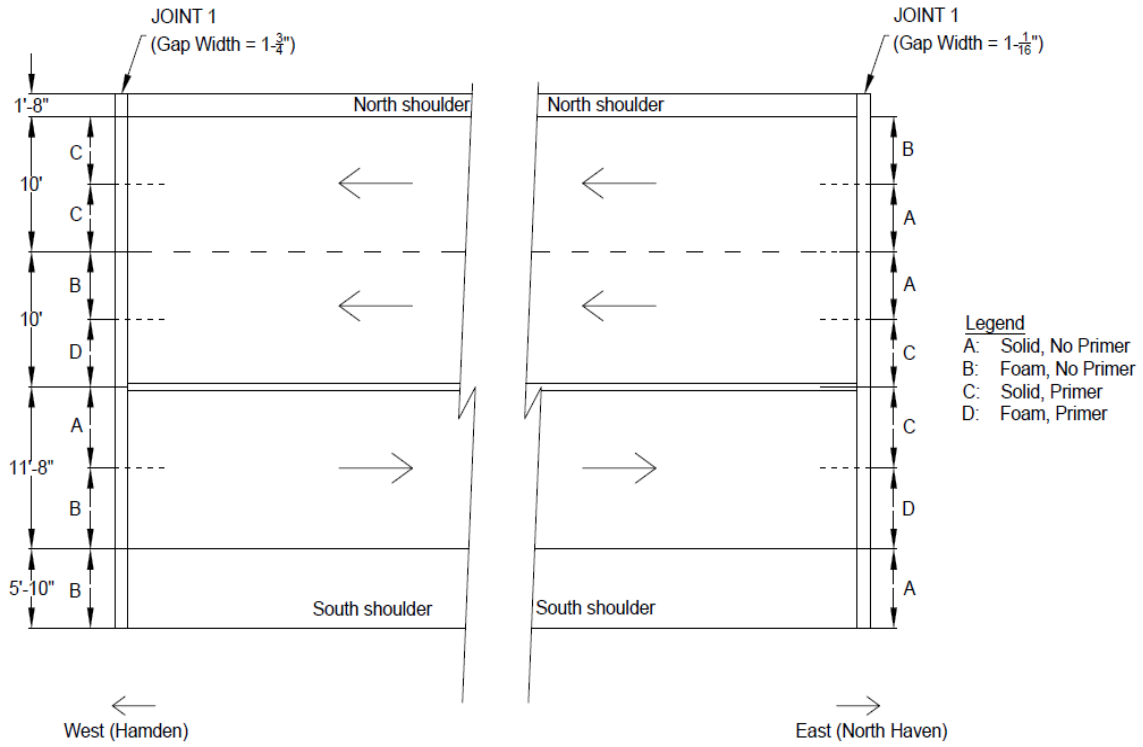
Sealant and primer placement plan, Route 22 Bridge
